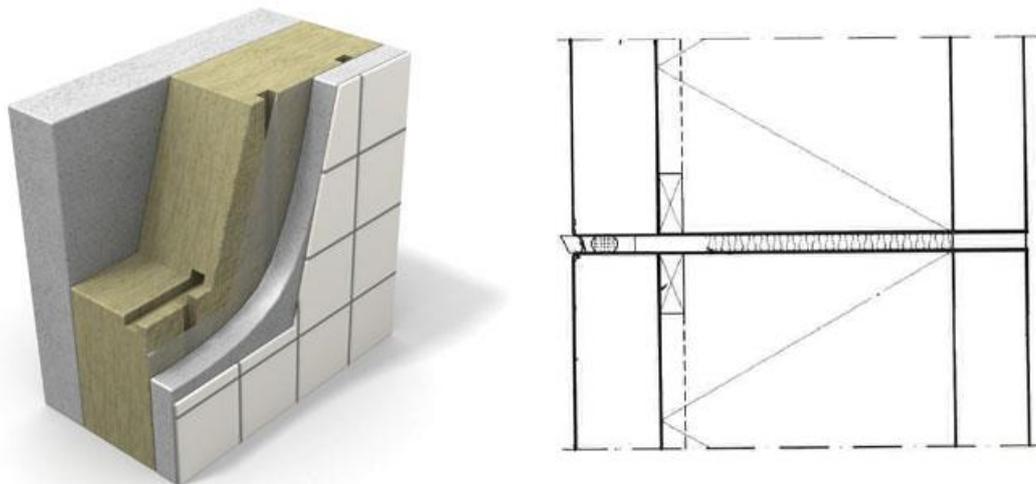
Ventilated stone wool insulation system used in concrete sandwich panel: a 3D illustration of the grooved insulation on the left and on the right a detail (side view section) from the air inlet/outlet pipes between the elements.
